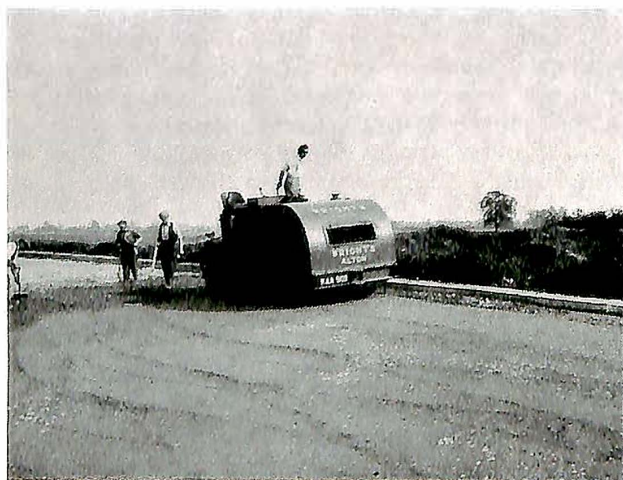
Compacting lean concrete with an 8-tonne tandem roller.
